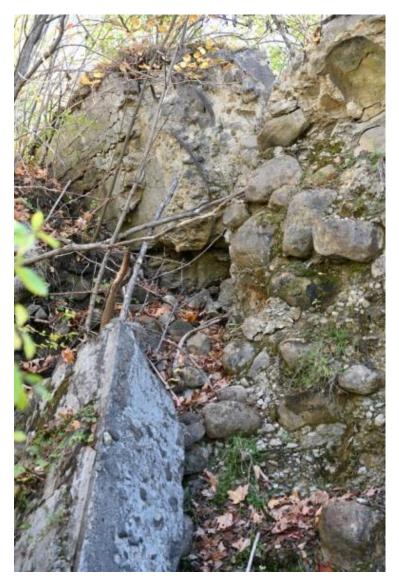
View of the compromised joint section between the spillway (closer) and the right wing sections of the dam, looking east southeast. The right wing structure is formed of rubble concrete and contains some metal reinforcement, possibly plain round bar and flat scrap metal pieces; this part of the structure also appears to have had another layer of concrete (a facing or a veneer) on its downstream side (two board formed surfaces appear to be visible).
